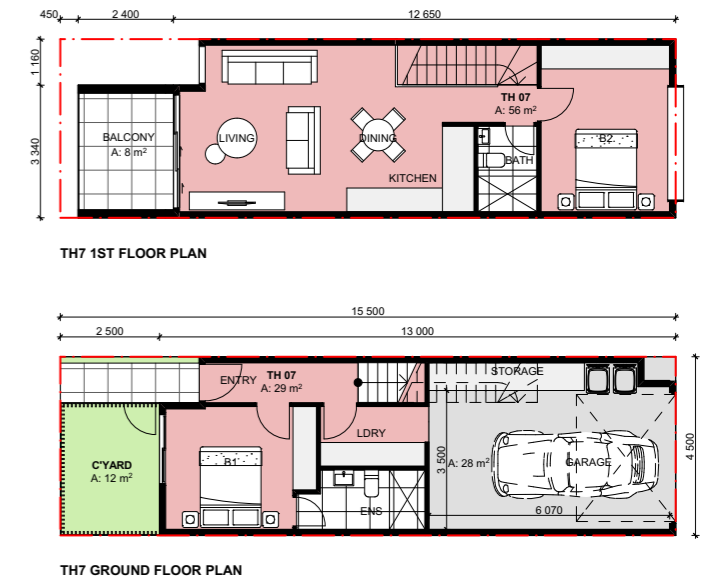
Townhouse Type 7 (Source: Plus Architecture)
